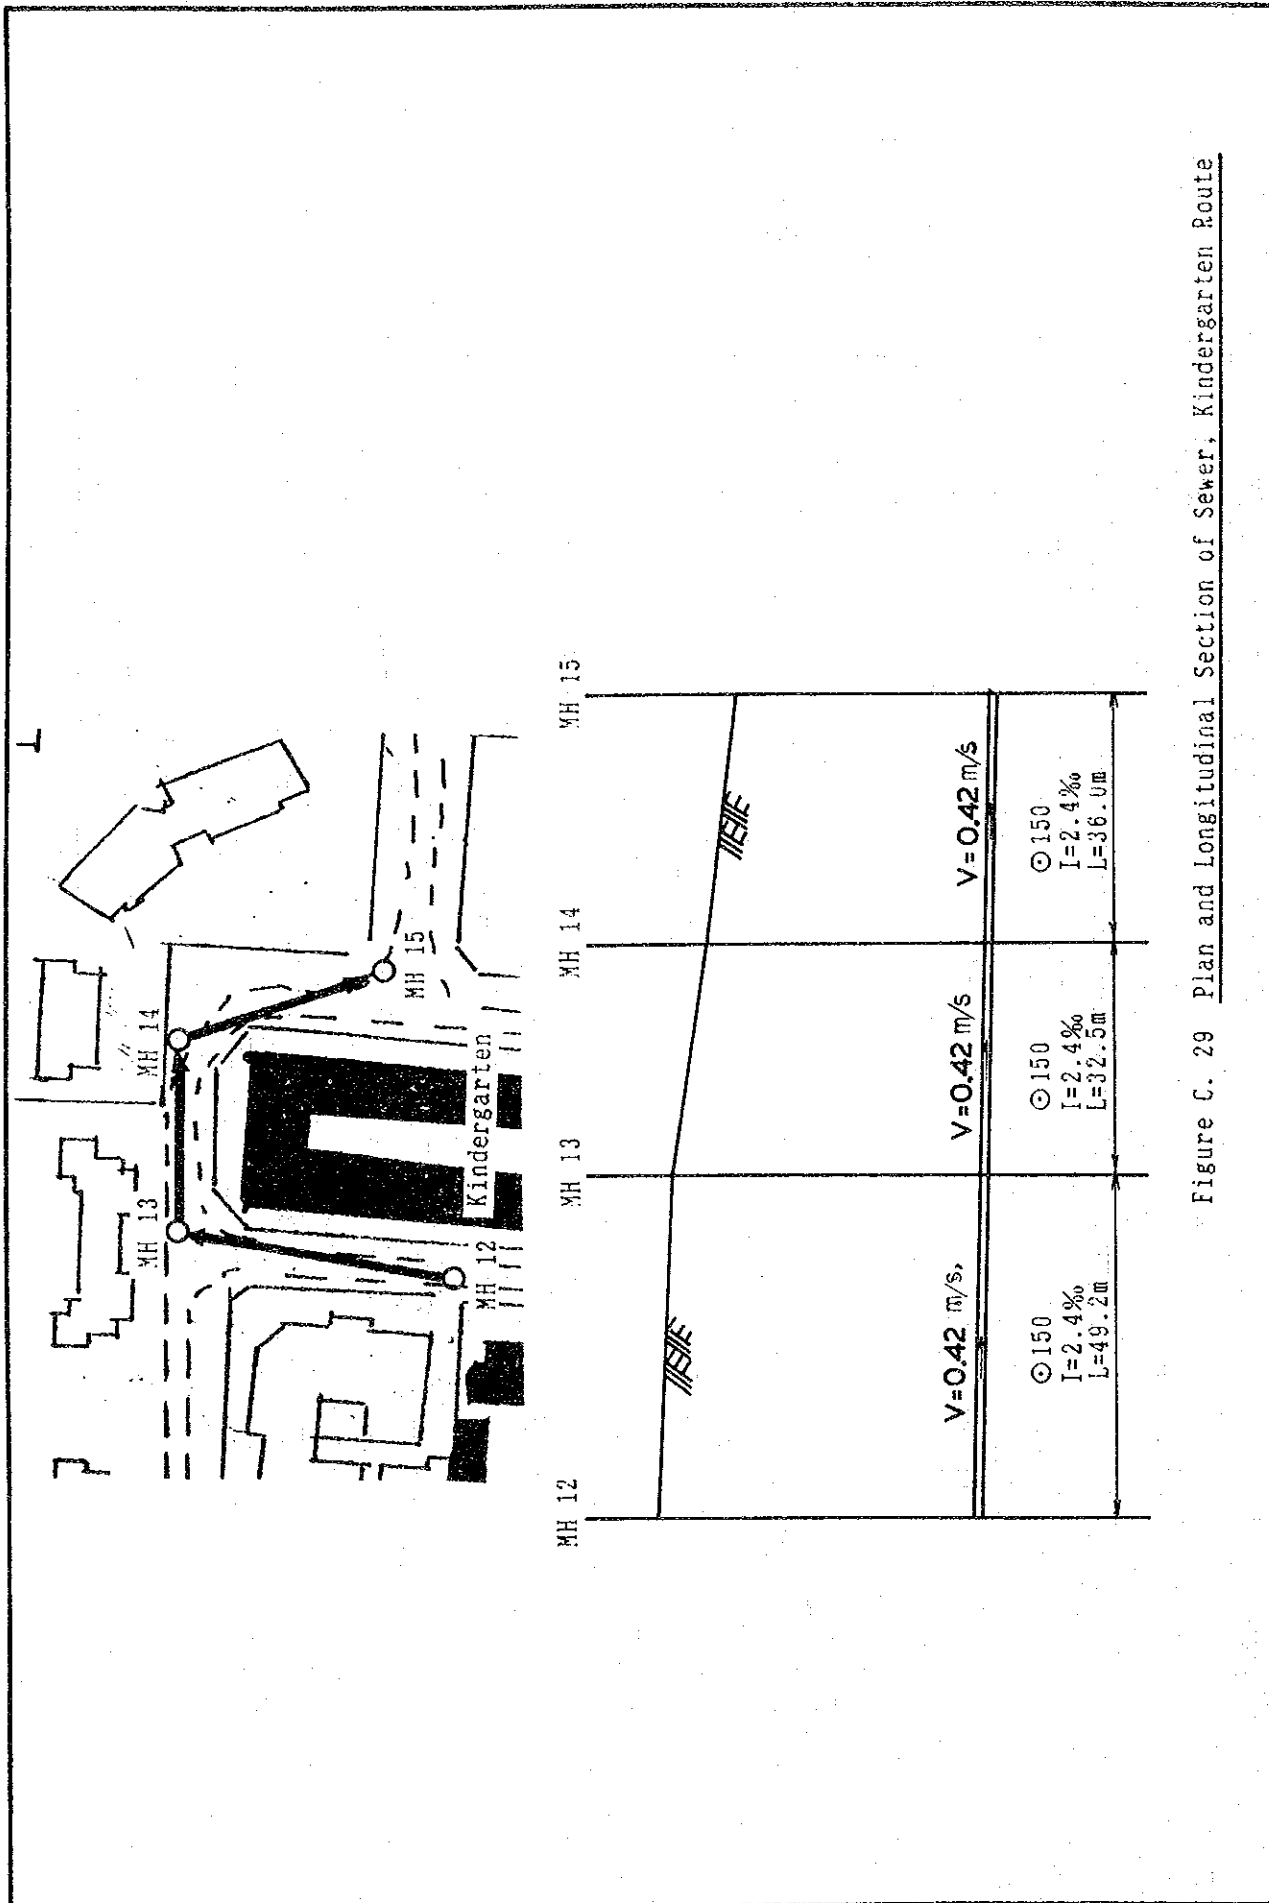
Plan and Longitudinal Section of Sewer, Kindergarten Route
